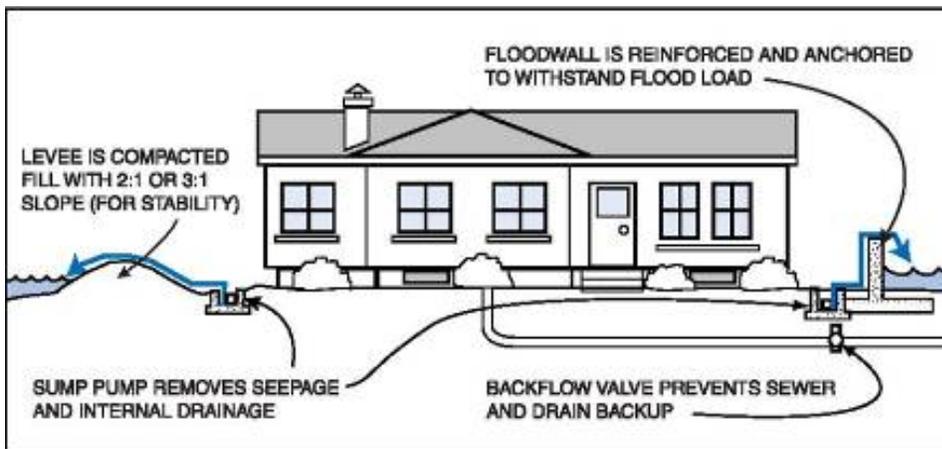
Structure protected by levee (on left) and floodwall (on right)
